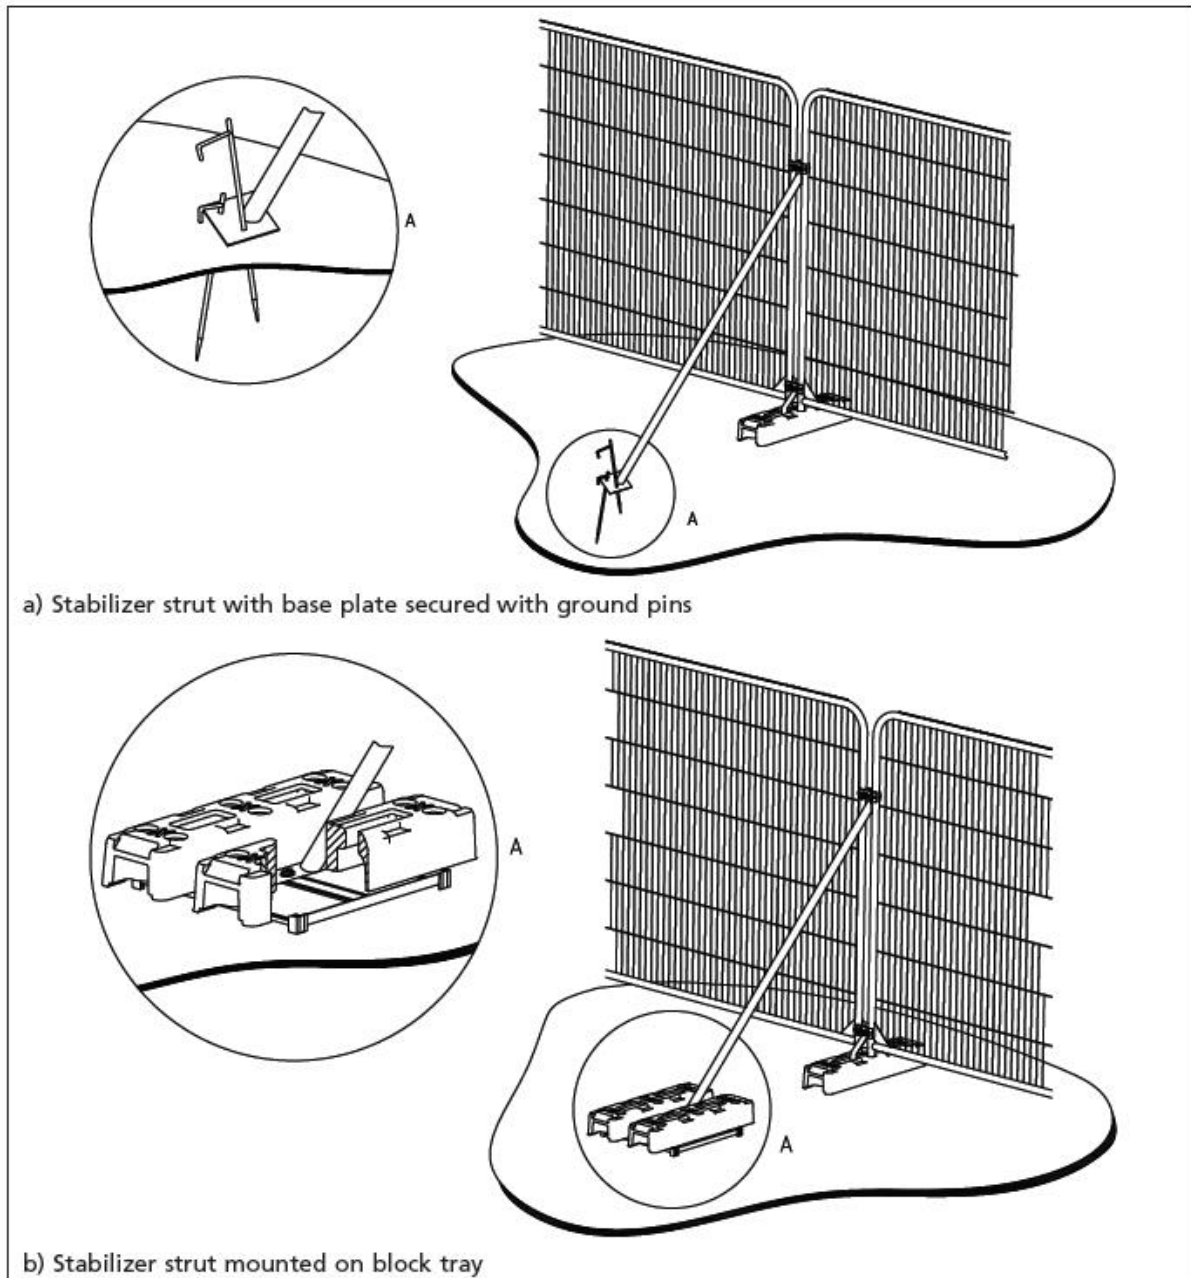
Alternative tree protection fence when it is not possible to mount TPF into the ground
